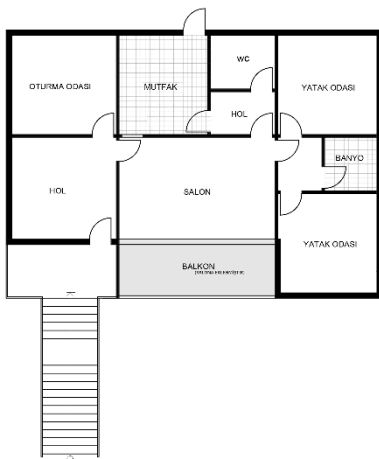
The house with a four-room plan from Şekertepe houses building cooperative houses (Filiz Sönmez Archive, 2022)
